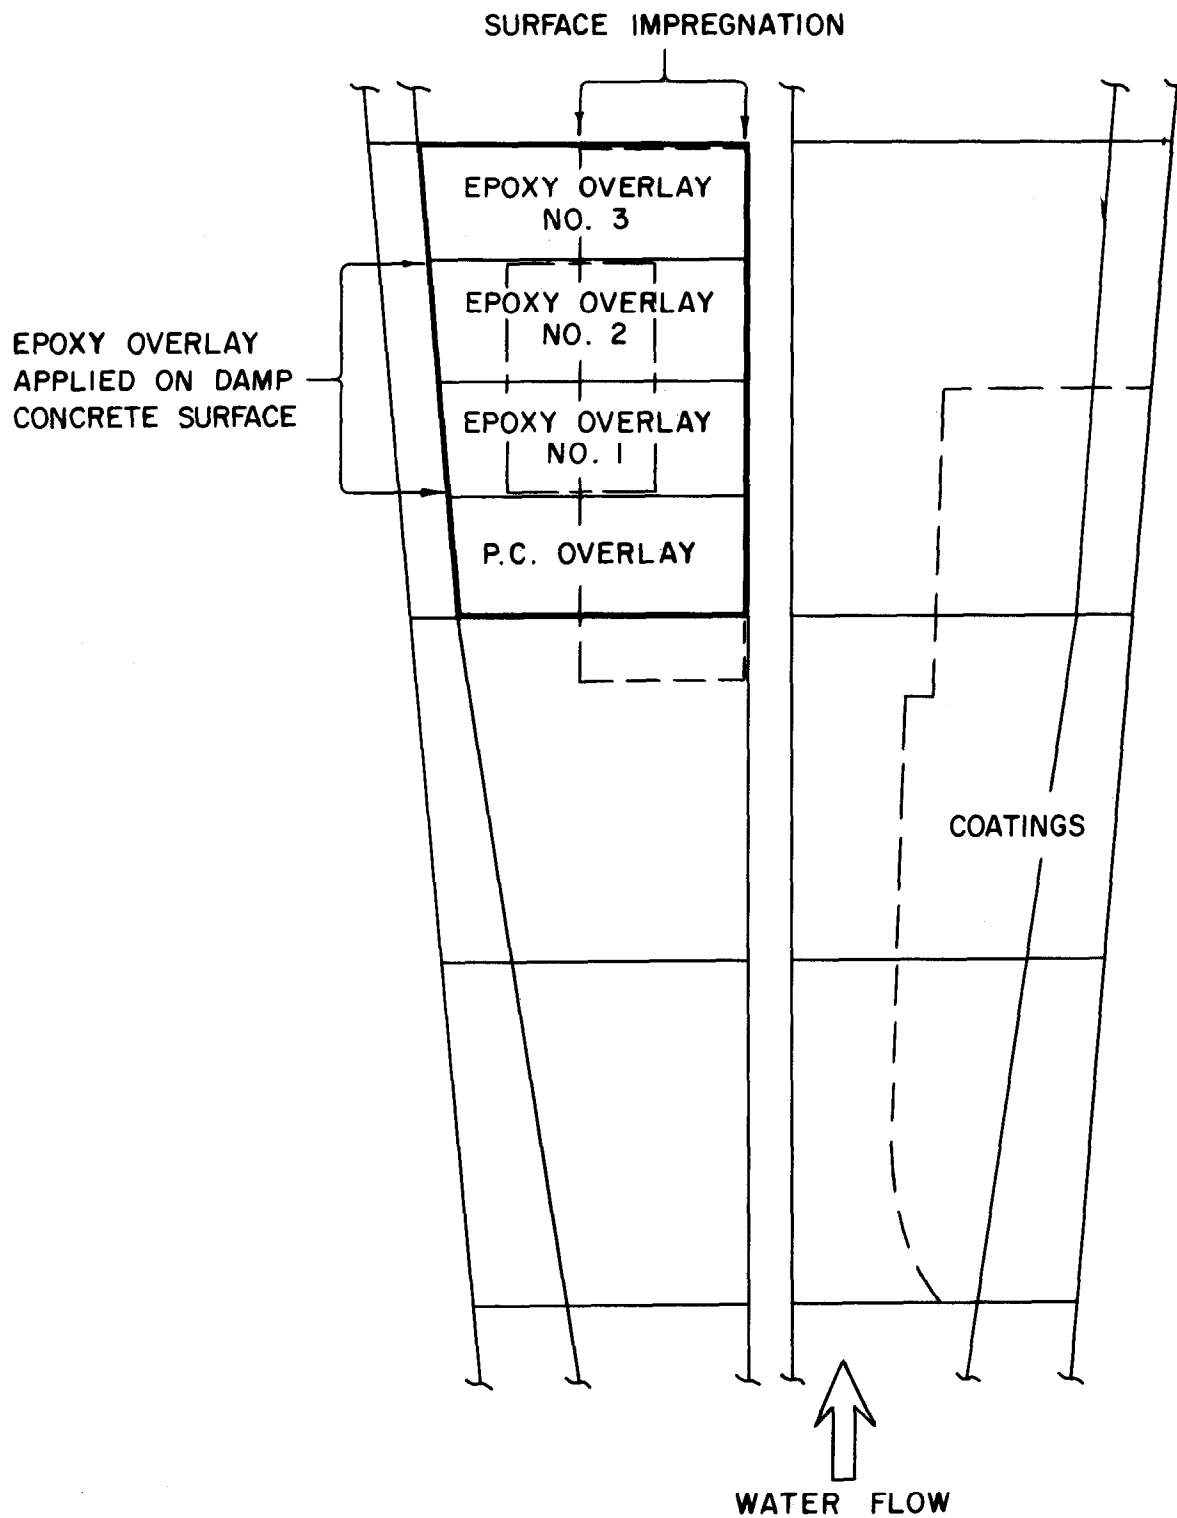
Schematic layout for experimental repairs on the floor of the Shadow Mountain Dam spillway.
